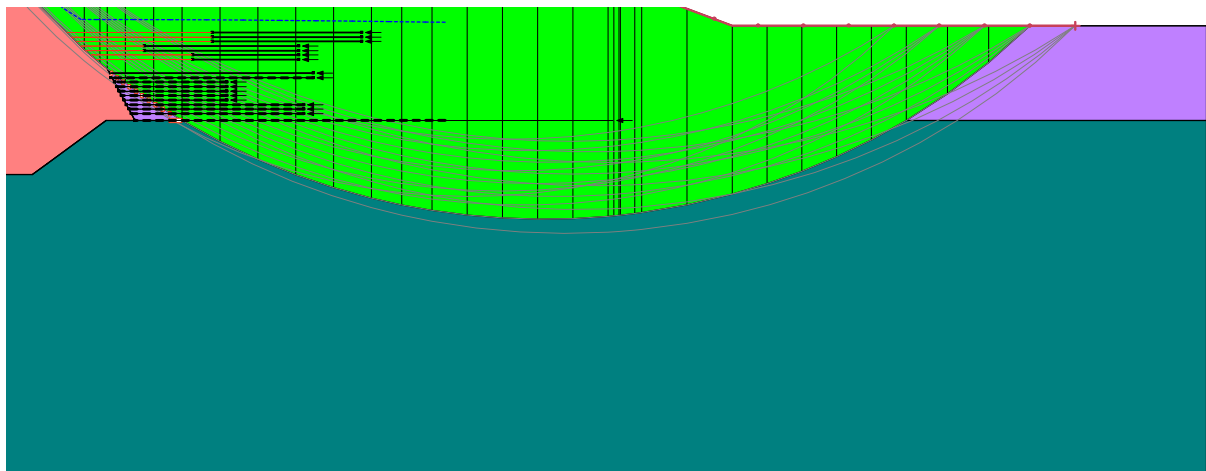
Detail A which shows how failure surface is intersected by reinforcement (2.5H: 1V)
